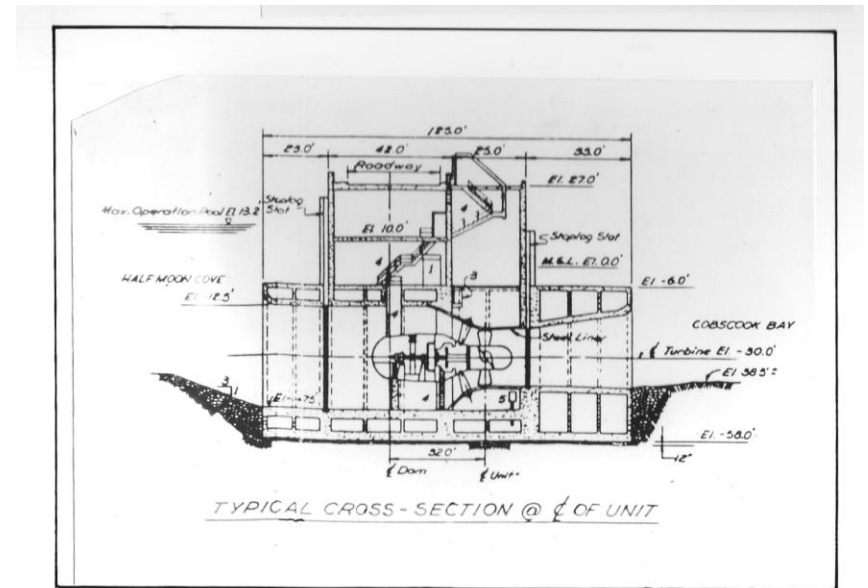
/ powerhouse cross-section (Chas. T. Main, engineers)
